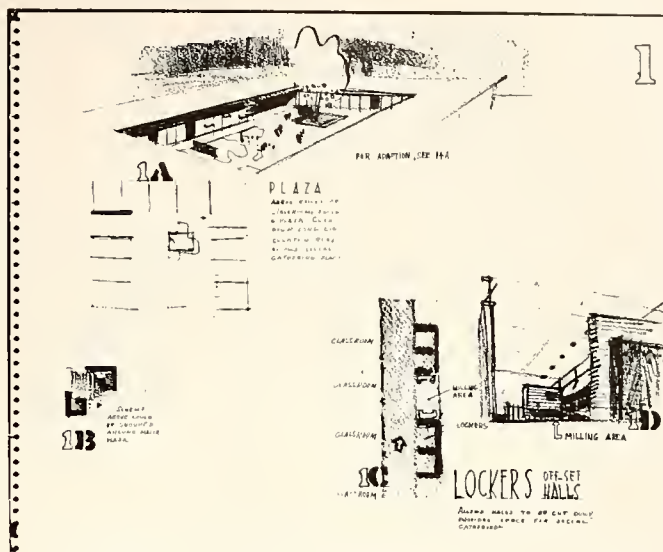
B: This diagram shows how scheme 1-A can be incorporated into a major layout plan.
